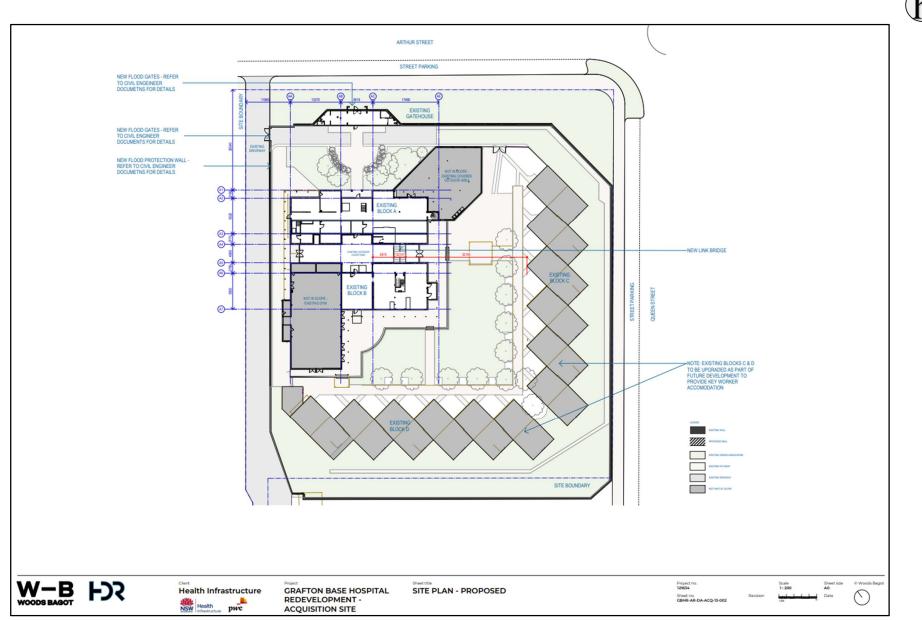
Grafton Correctional Centre Acquisition Site- Site plan
